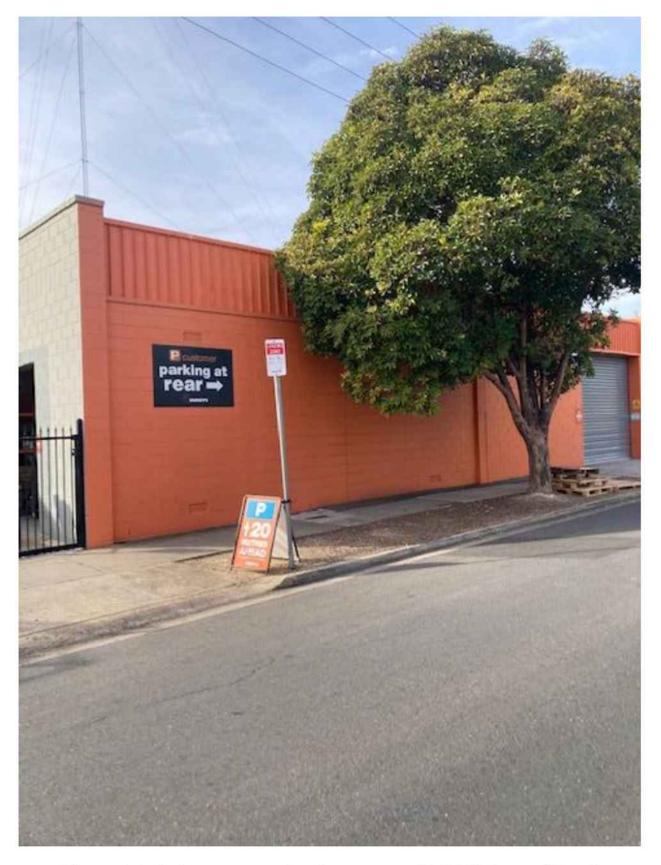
Existing on-street loading area at 90-94 Richmond Road
